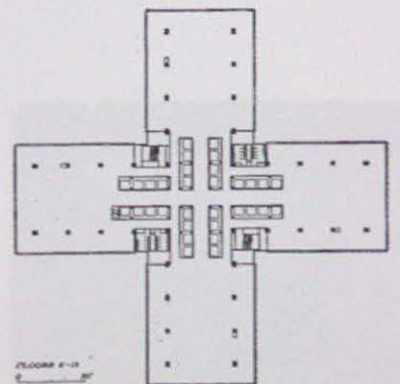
Typical plan, floors 8-13, Place Ville-Marie.
